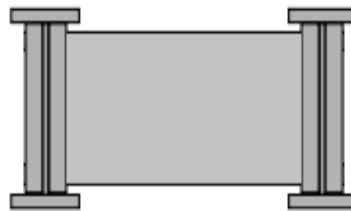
Bent plate diaphragm (FHWA Bracing Systems)
